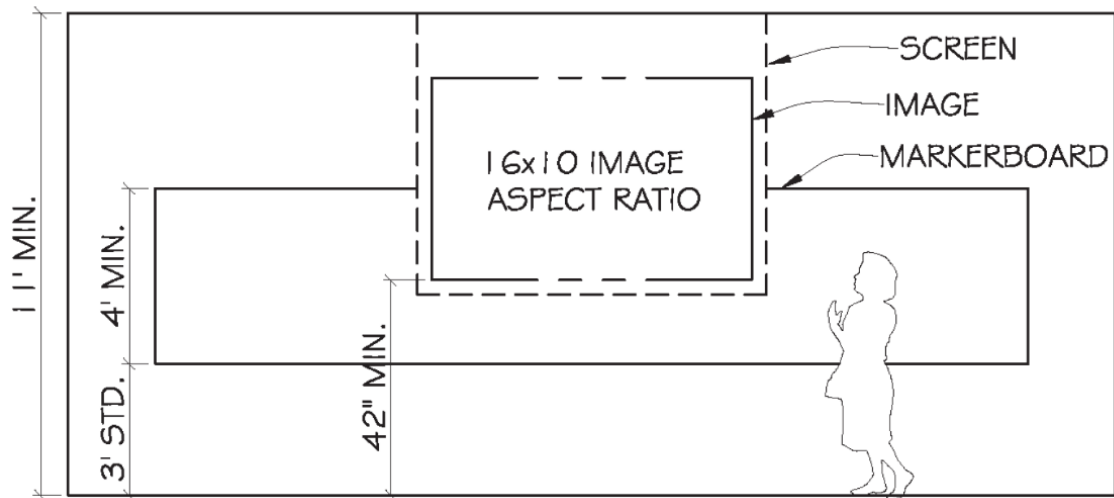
FLAT-FLOOR ROOM SECTION WITH STANDARD MEASUREMENTS
